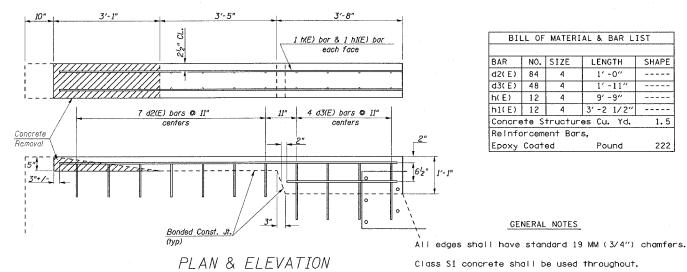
## DETAIL OF WINGWALL MODIFICATION SN 015-0003/0004
